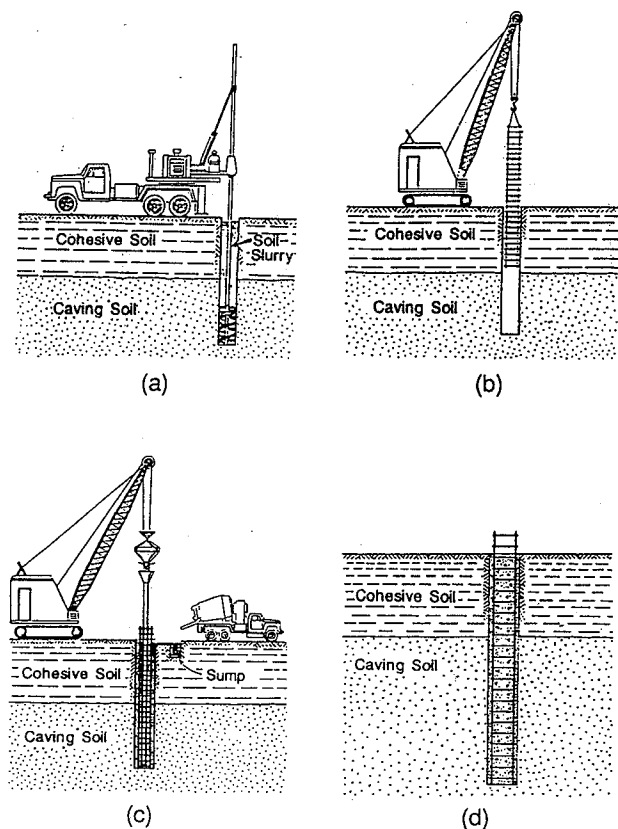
Slurry method of construction: (a) drilling to full depth with slurry, (b) placing rebar cage, (c) placing concrete, (d) completed shaft. (From Reese and O'Neill, 1988)
